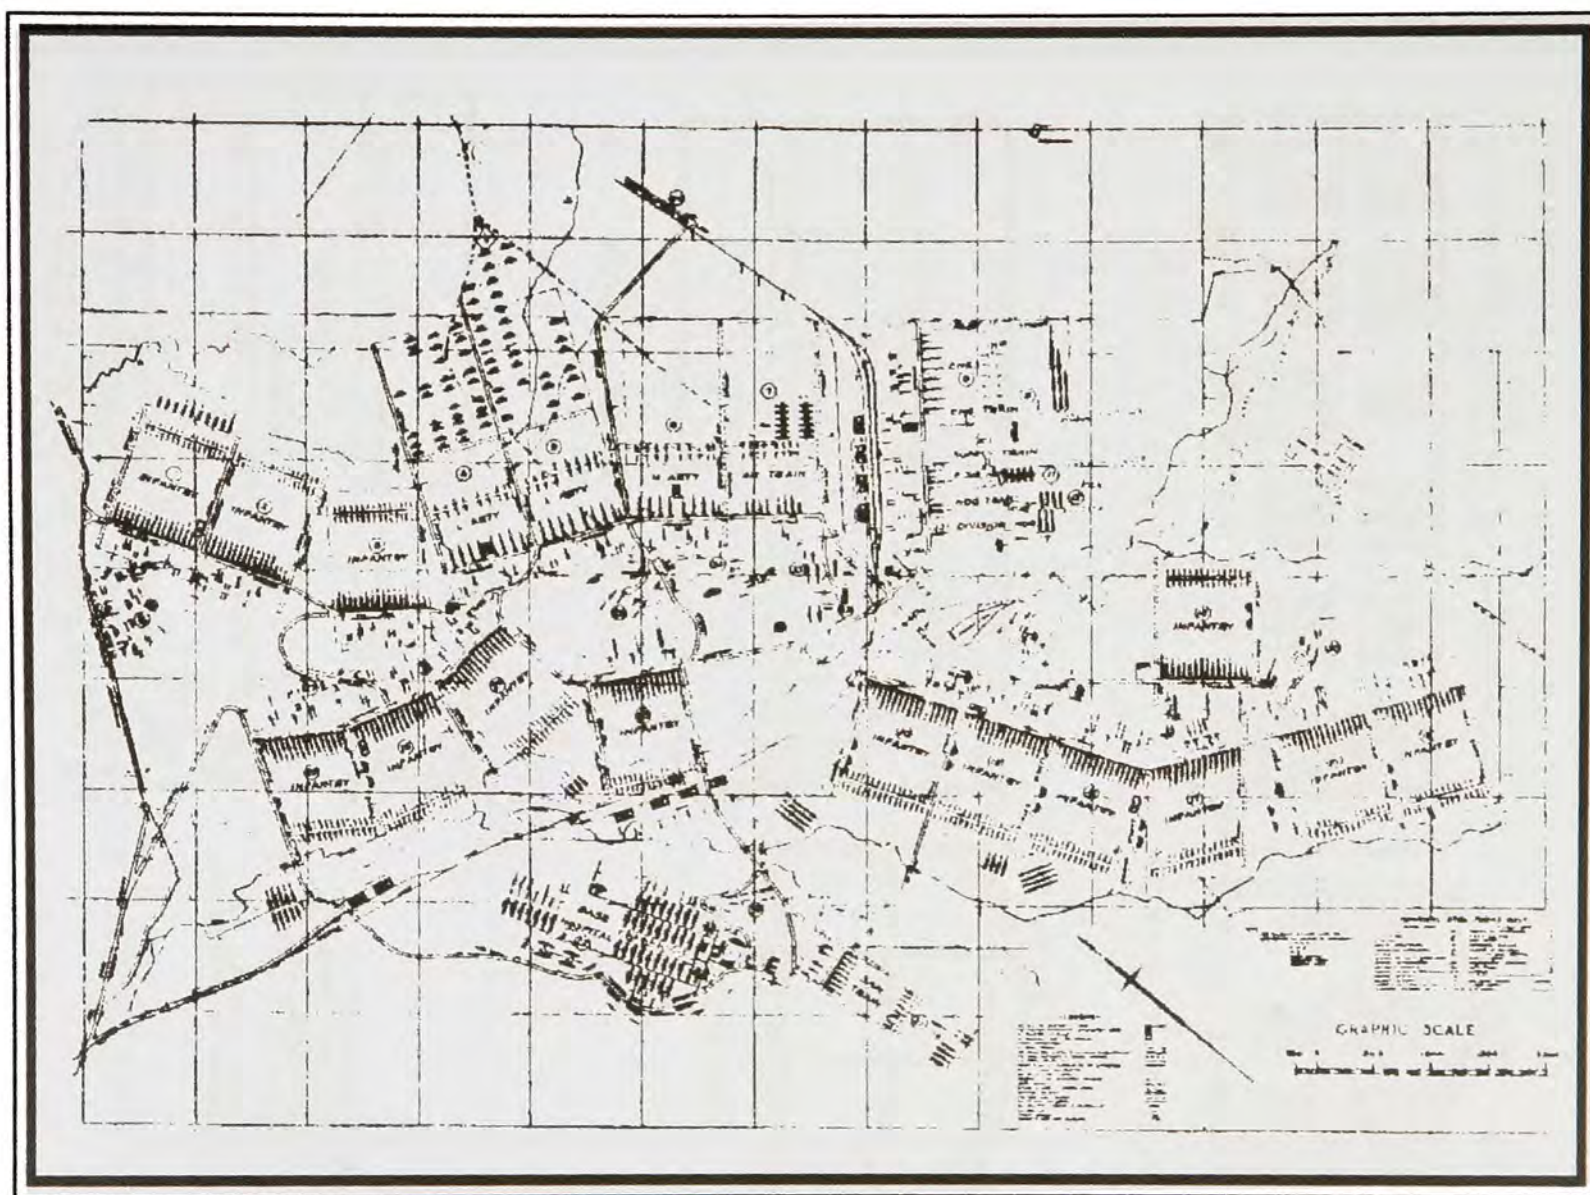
General plan, Camp McClellan, Alabama 1918 (National Archives).
